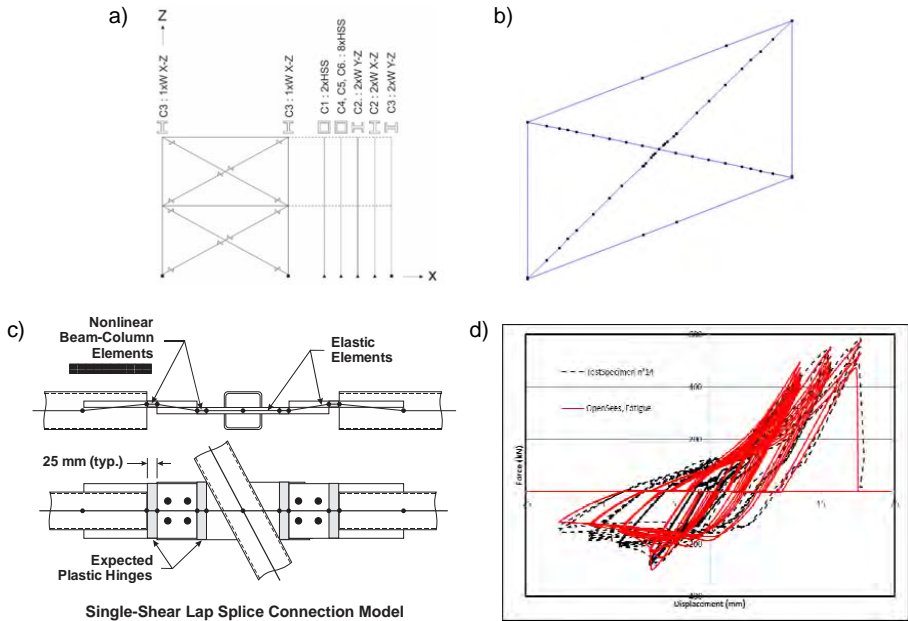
Numerical model: a) Braced frame elevation; b) 3D view of a braced frame storey; c) Mid-connection model; and d) Validation of the connection fatigue model.
